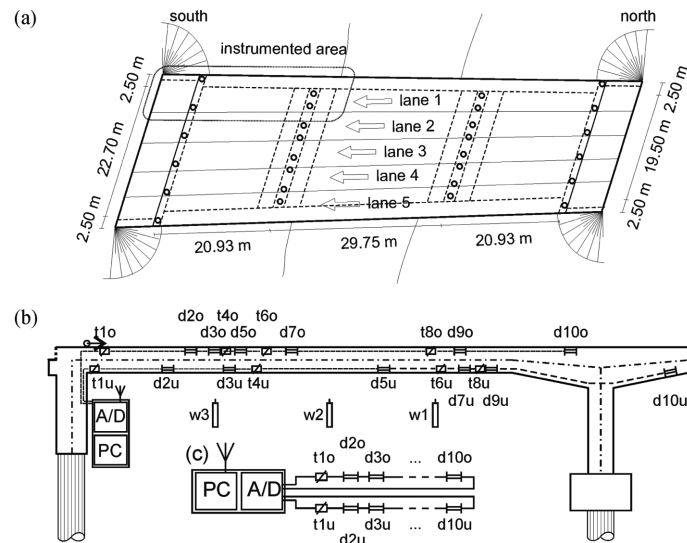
Monitoring installation plan of the Bridge system S33.24: (a) top view indicating the traffic lanes and instrumented area, (b) longitudinal cut of S33.24 including sensor placement in the deck slab of the southernmost span and (c) serial system topology of fiber optical monitoring system
